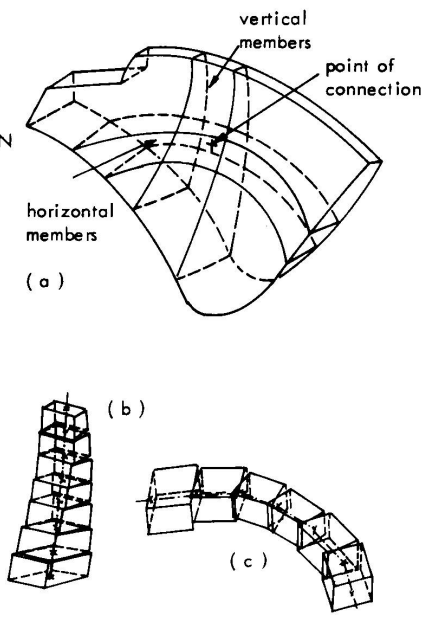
(a) The arch dam showing the location of (b) typical vertical and (c) typical horizontal members
